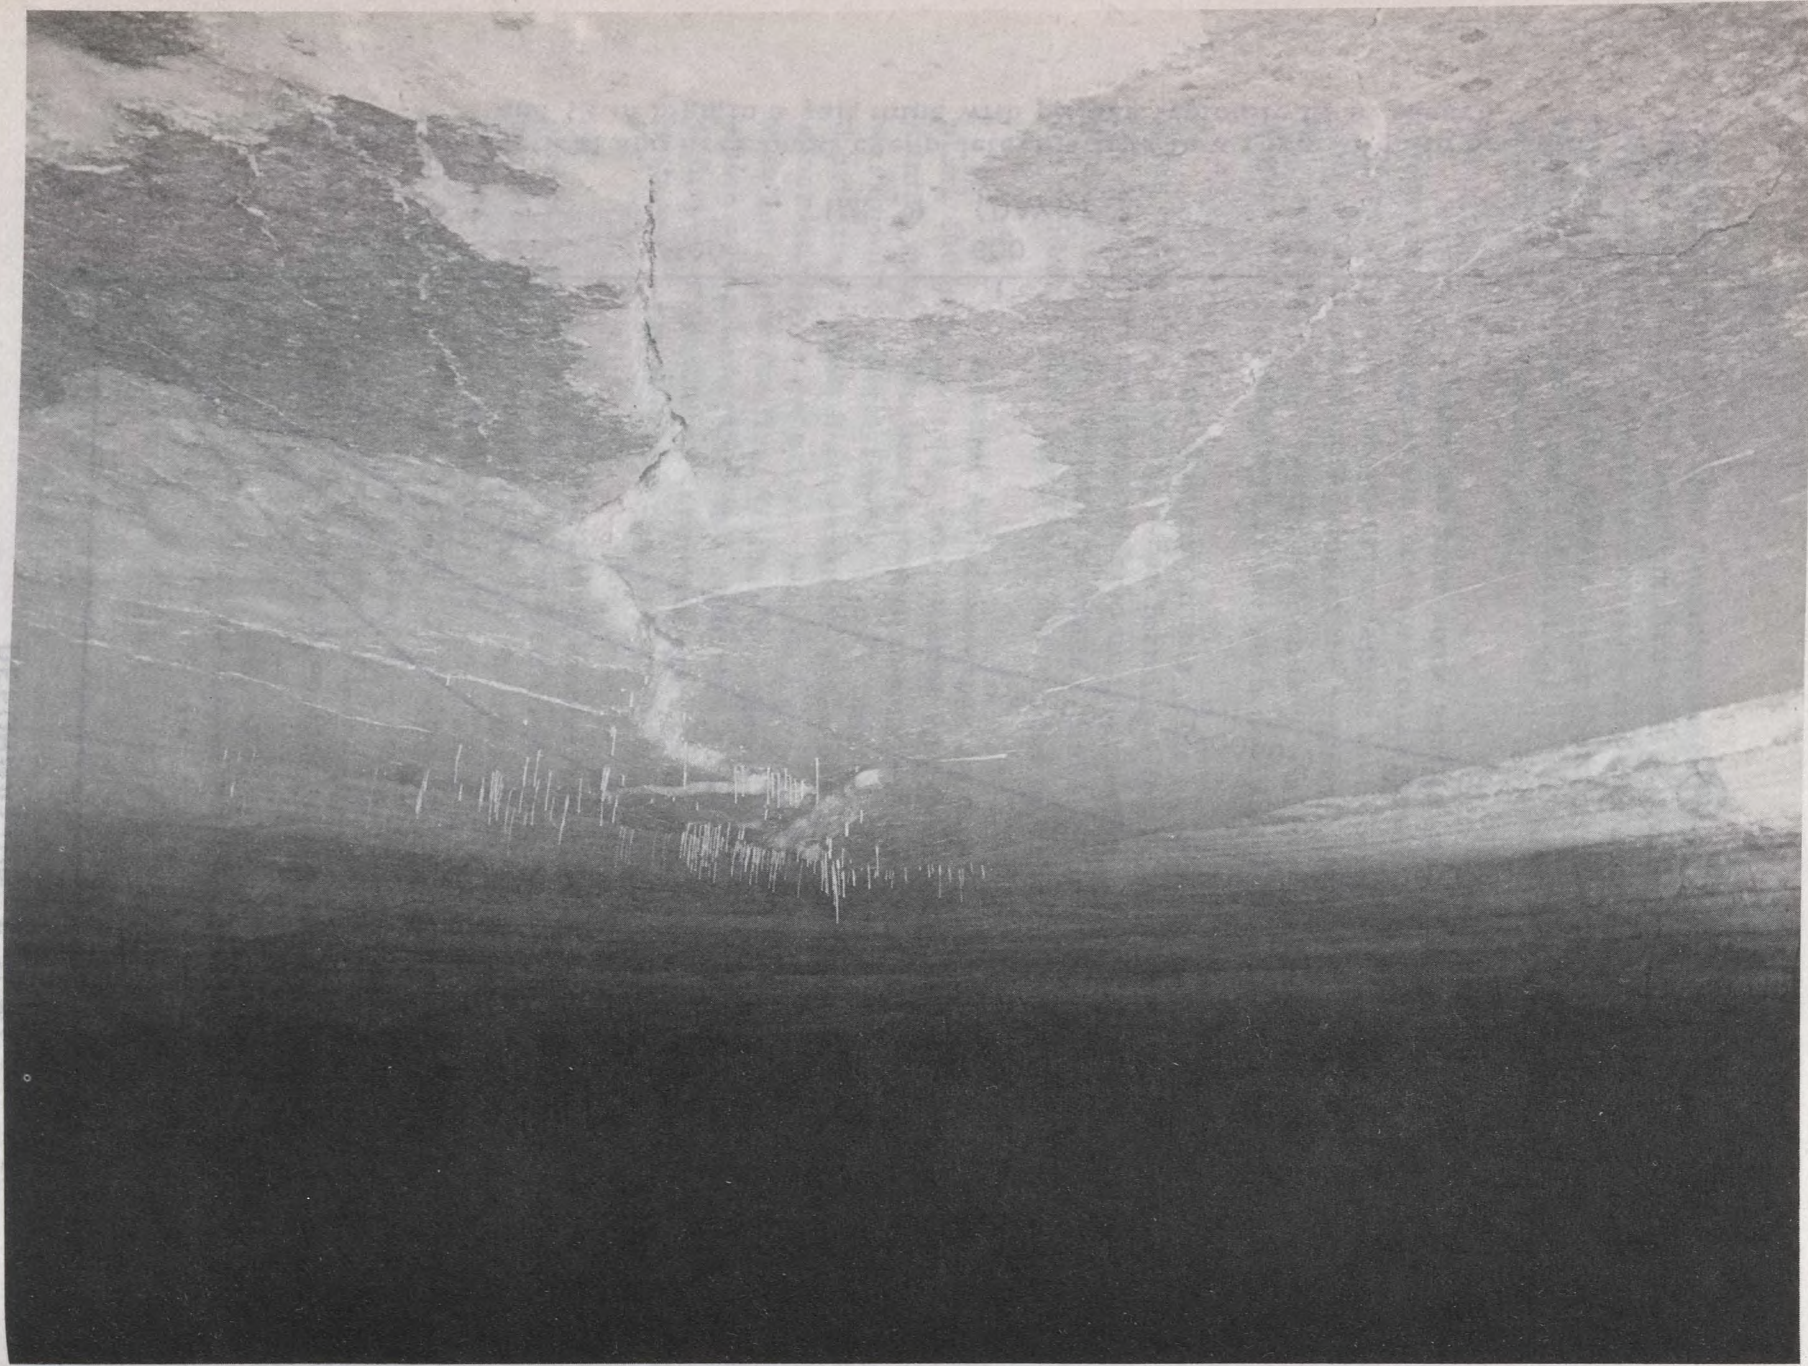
Buckling in the roof of a salt mine preceding a second fall from this area.
